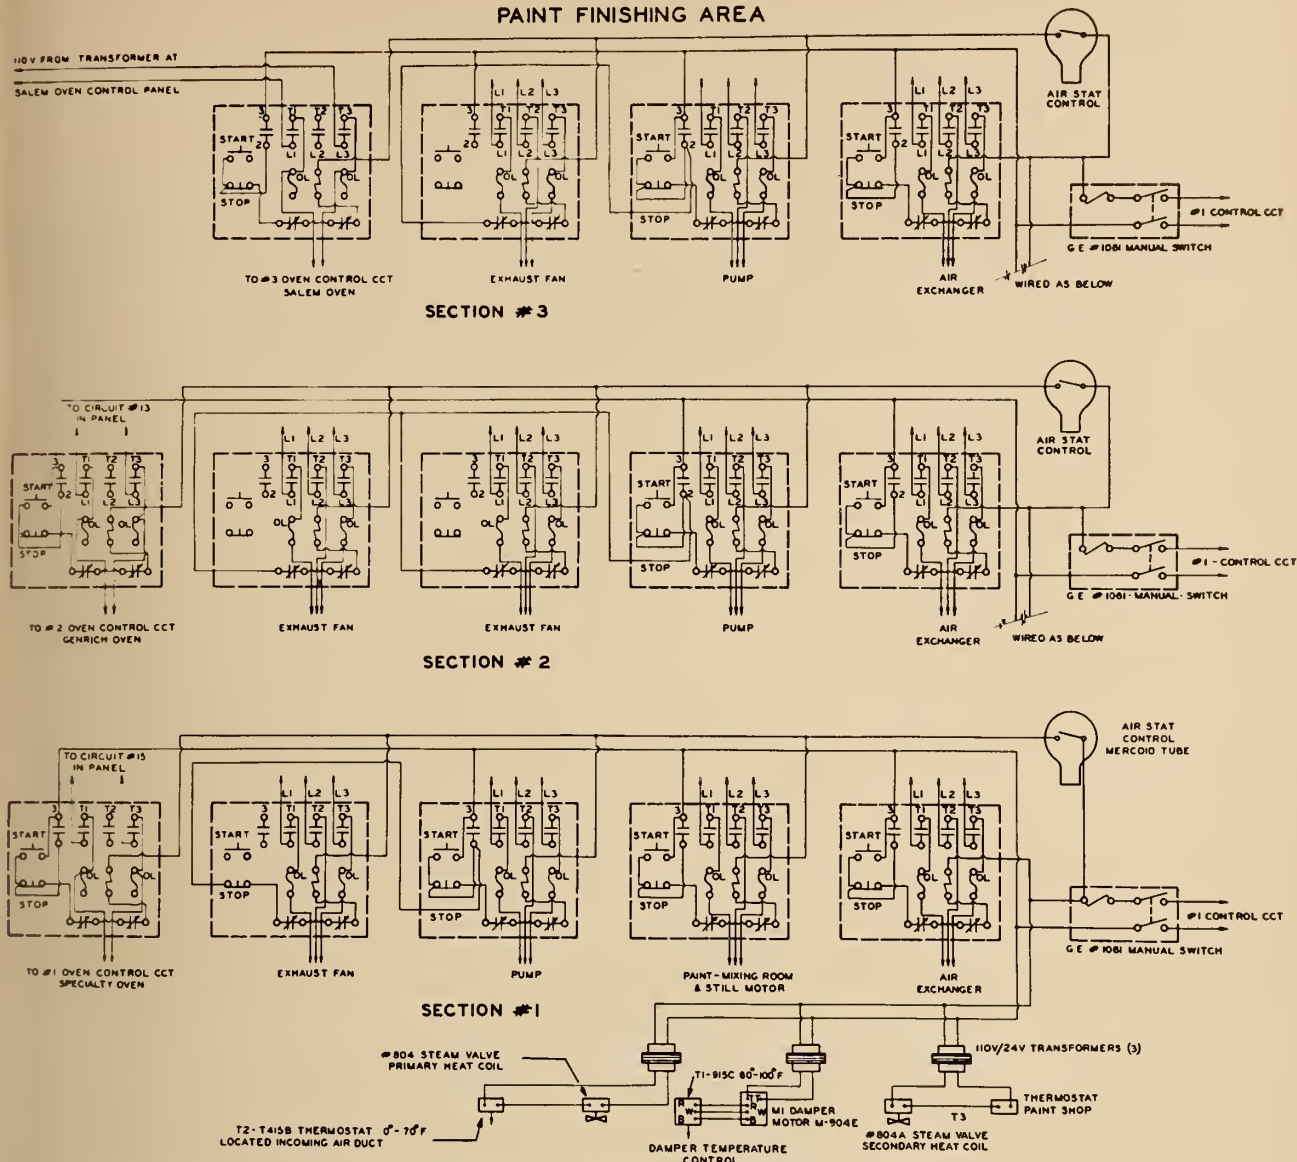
Schematic wiring diagram of the 110 volt control circuit showing interconnection of motor starters, which prevent air from being exhausted without filtered air being drawn in.
